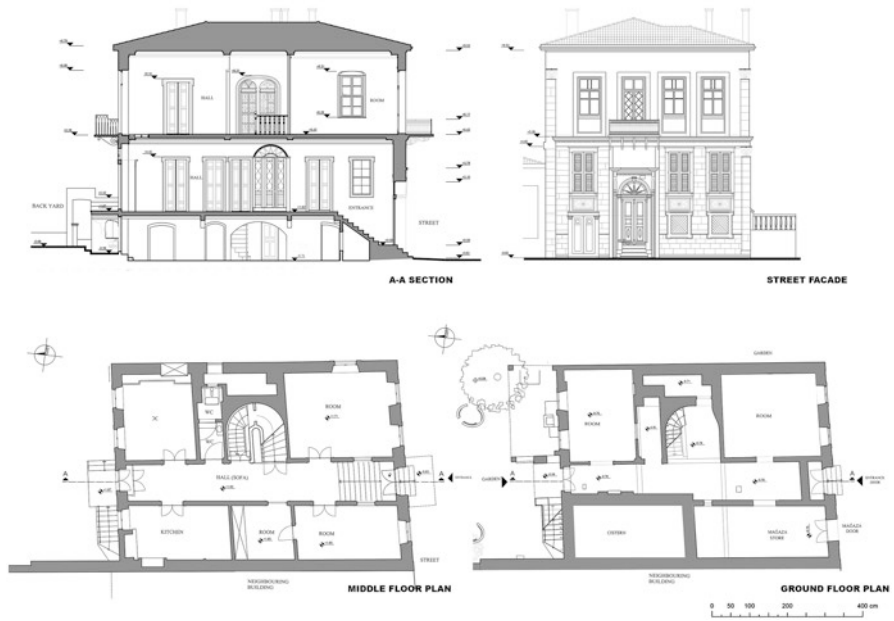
Plans of ground floor and middle floor, the section and street facade of a traditional Cunda house on Ayvalik Street
